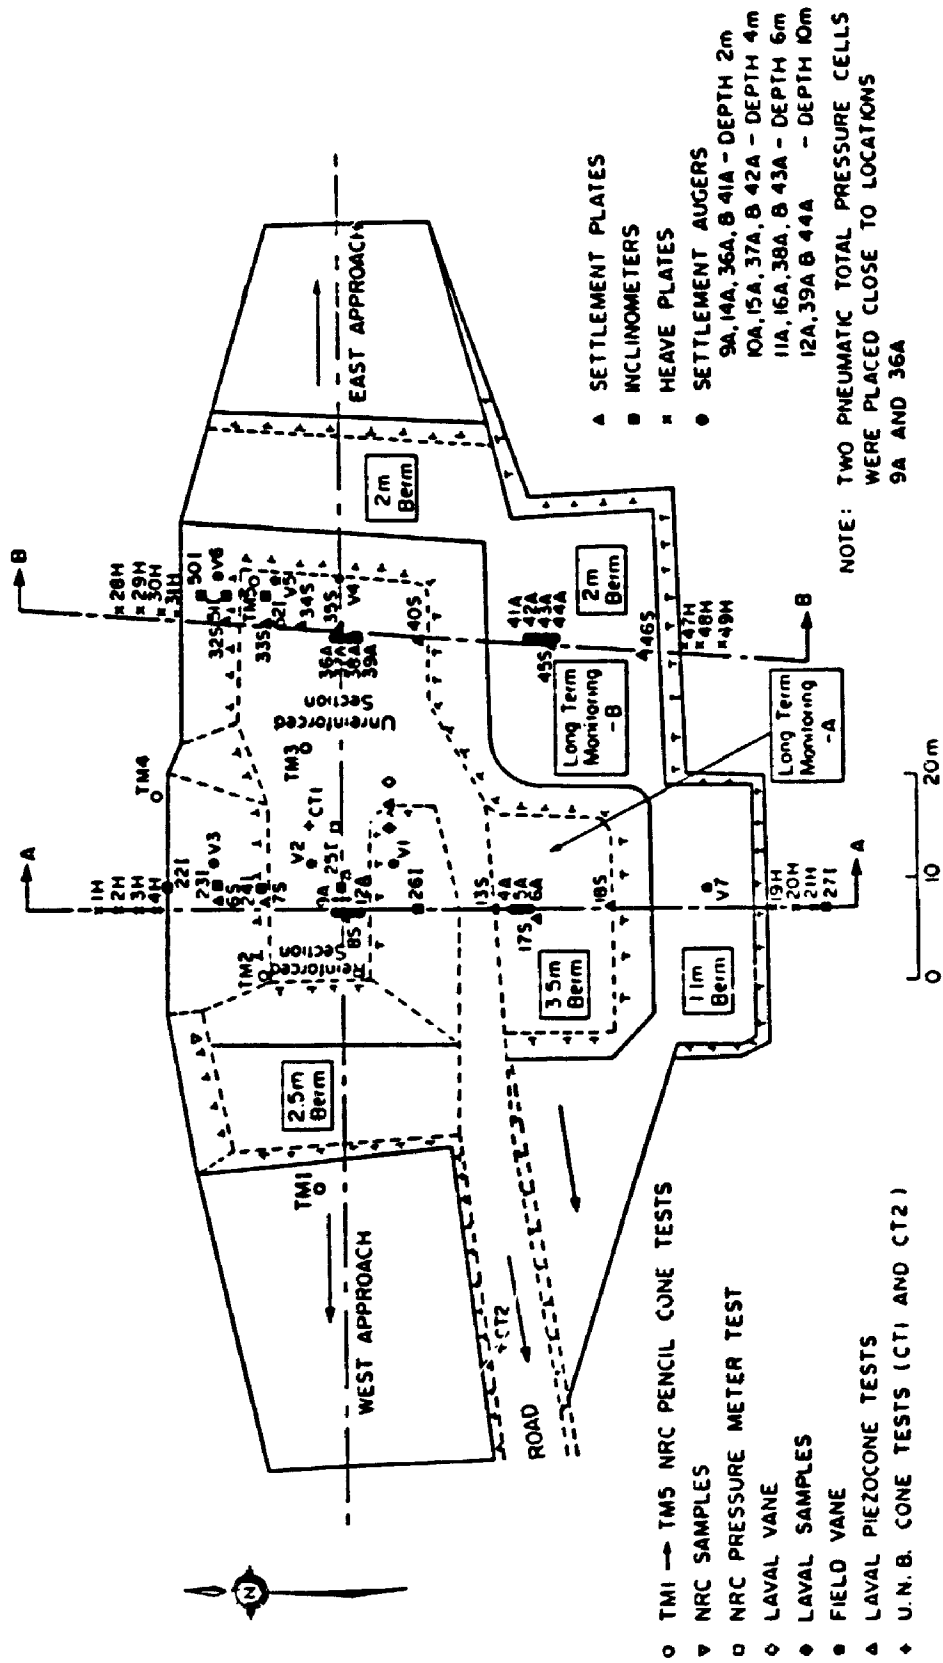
LAYOUT OF INSTRUMENTATION - PLAN
